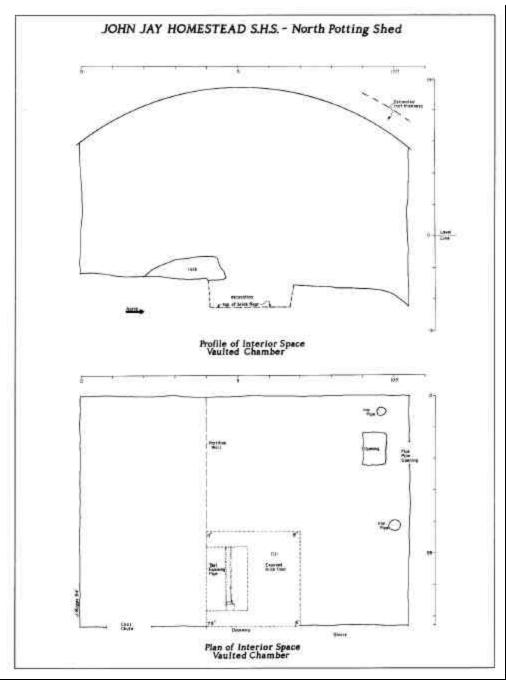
Profile and plan views of the interior of the buried chamber. Note in the plan view the opening for the coal chute to the left, the drainage pipe exposed in Test Unit l directly inside the doorway, and the location of the iron pipes where the coal furnace once sat.
